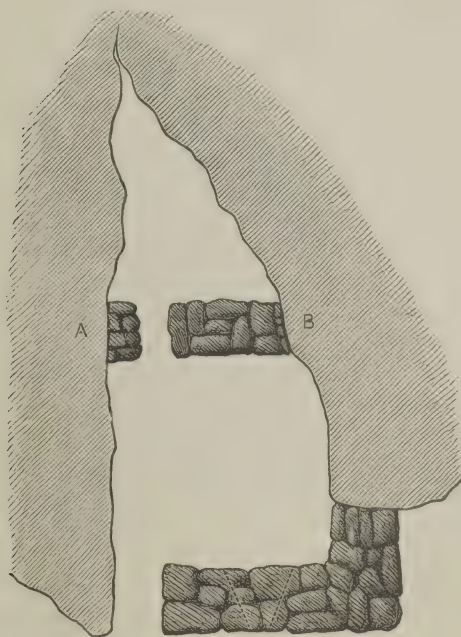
Sketch Plan of the *Chapel Cove* of St Medan.
